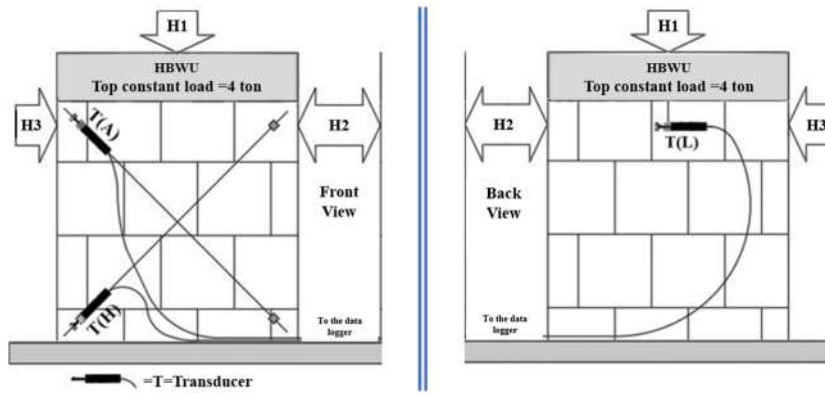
Masonry wall HBWU: hydraulic jacks and displacements transducers scheme.
